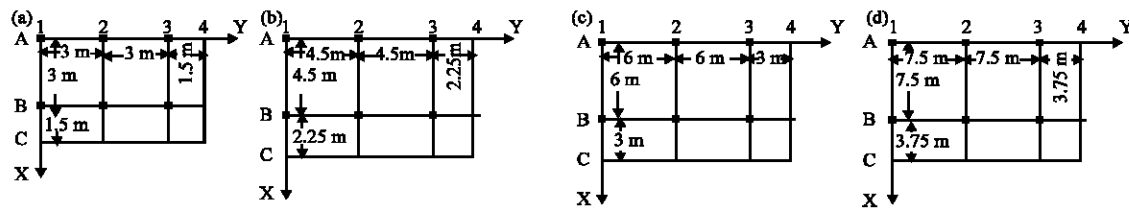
Plan of quarter rafts and position of columns; (a) 3 m, column spacing, (b) 4.5 column spacing, (c) 6 m column spacing and (d) 7.5 column spacing
